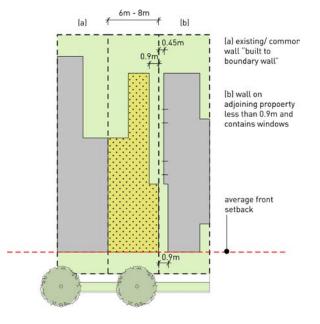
MATCH EXISTING BUILT TO BOUNDARY WALLS AND WALL ON ADJOINING PROPERTY LESS THAN 0.9M
